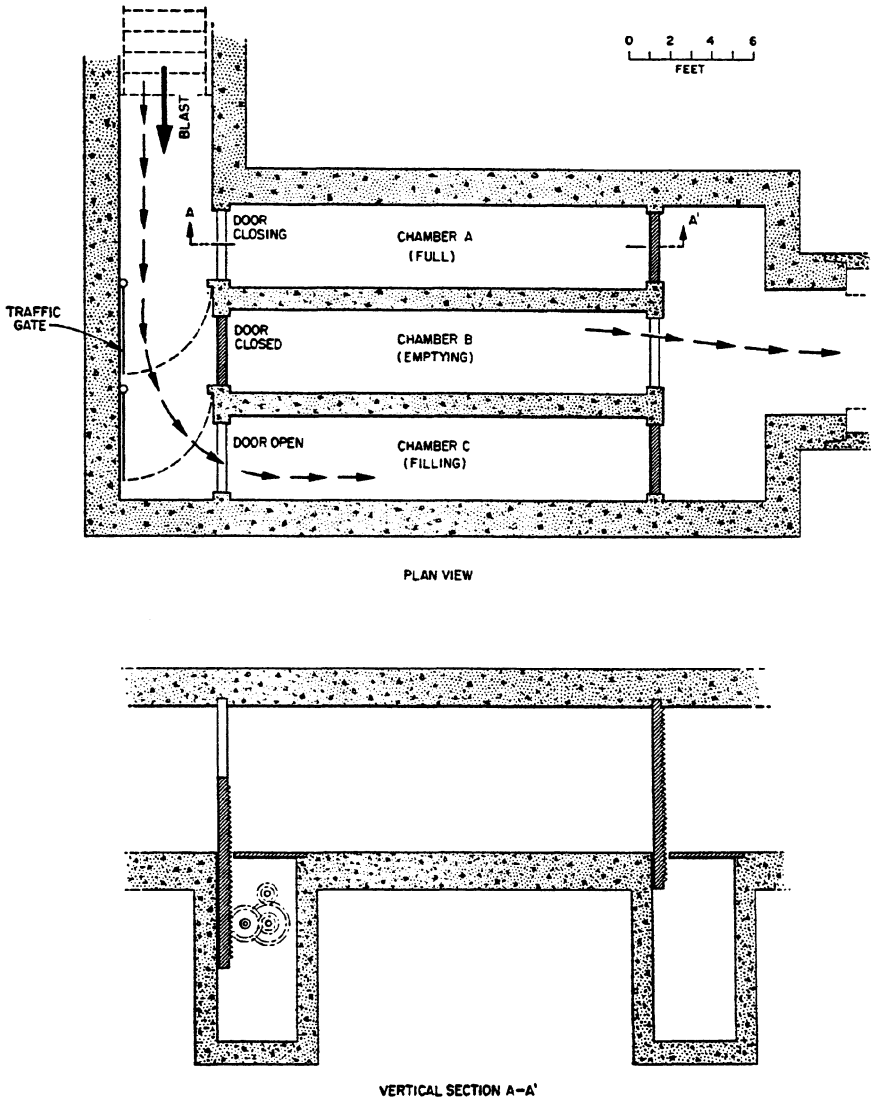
Plan view and elevation of entrances. The plan view shows how the "locks" function. [Oak Ridge National Laboratory]
